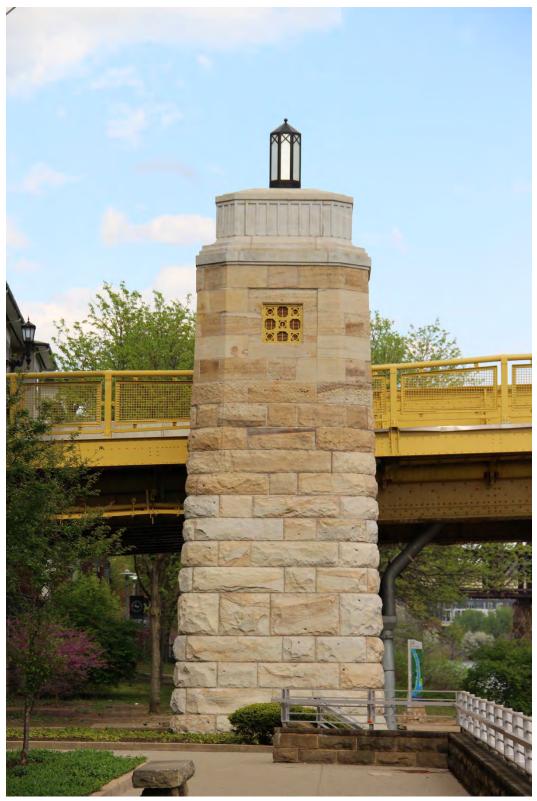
Rachel Carson Bridge (April 2024), detail of west elevation of northwest pylon, facing east.
